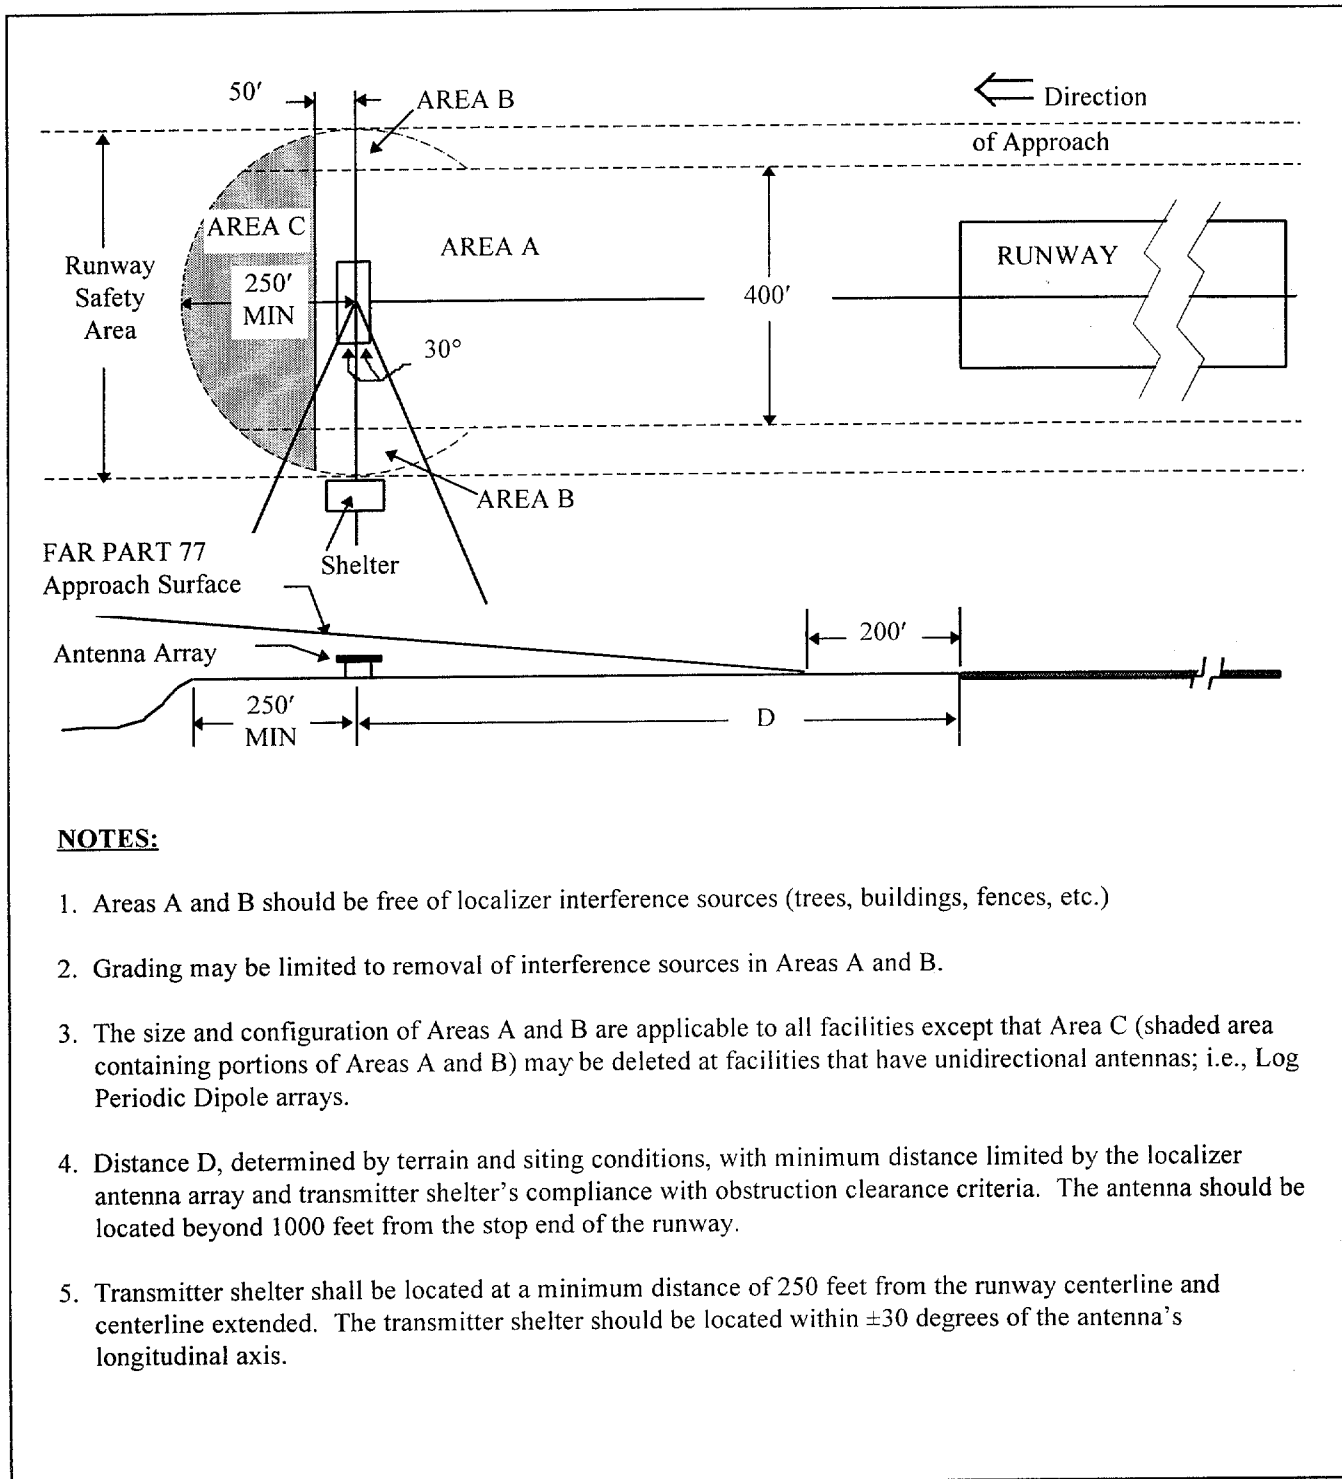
TYPICAL LOCALIZER PLOT LAYOUT AND SITE GRADING REQUIREMENTS
